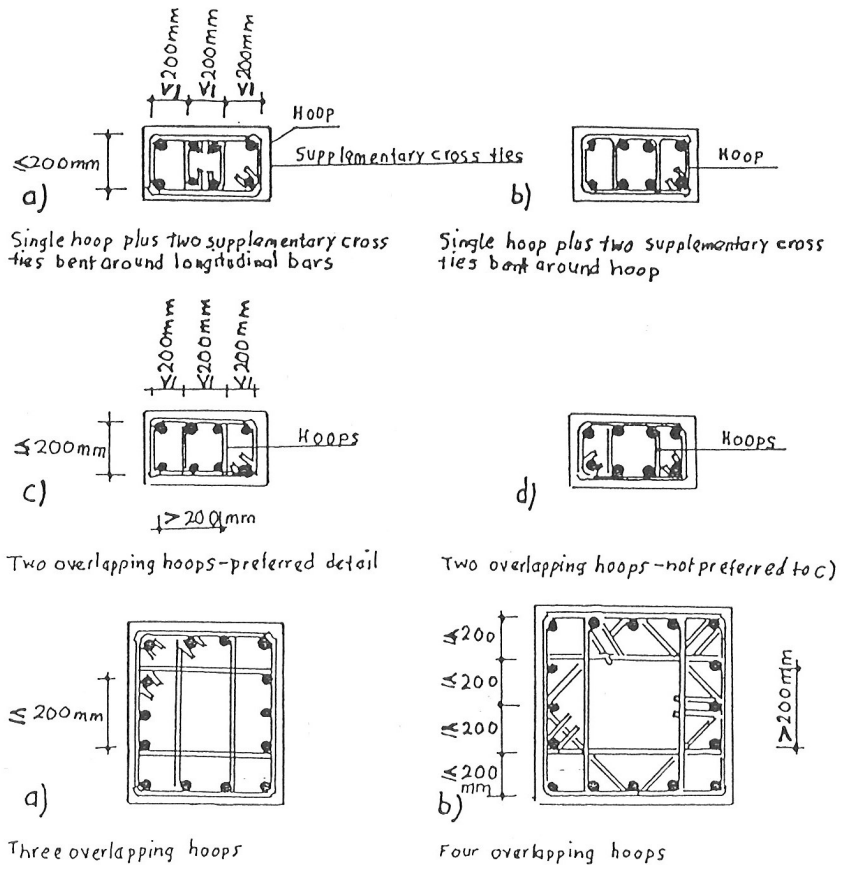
TYPICAL DETAILS USING OVERLAPPING HOOPS
